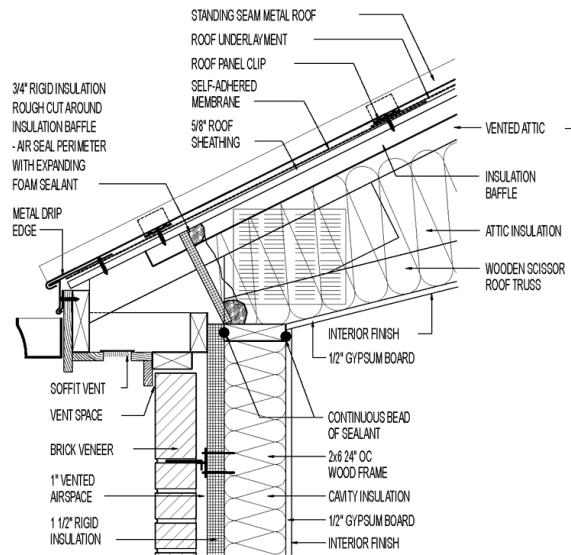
SECTION VIEW OF AS BUILT ROOF
